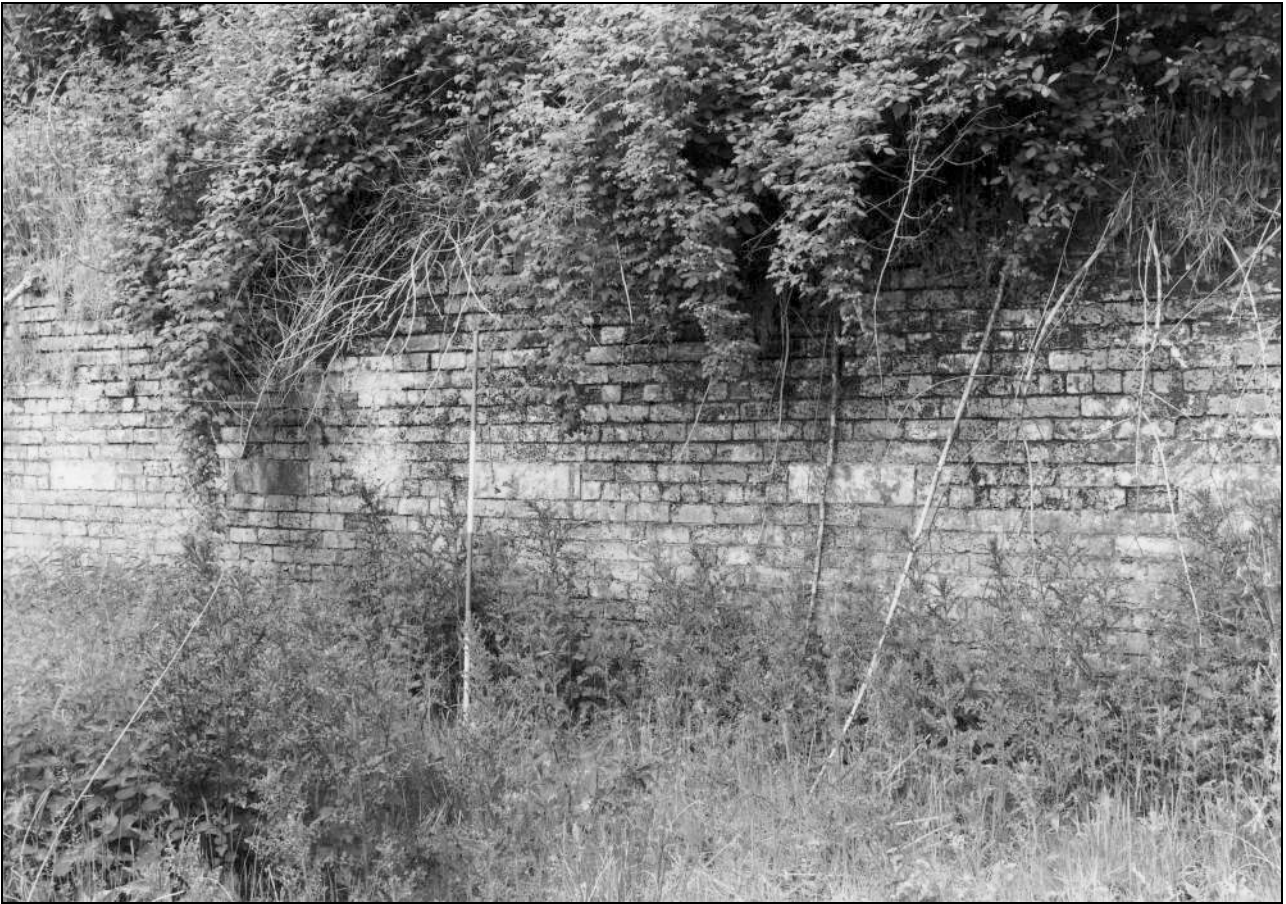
Retaining wall forming west side of demolished weaving shed (film 2, frame 17)
